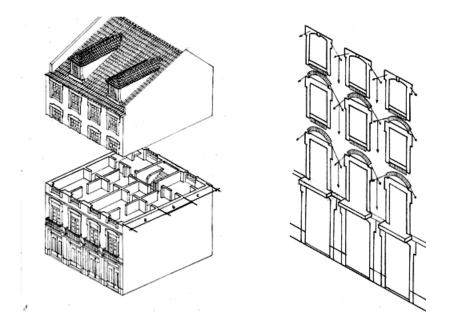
Perspective of a forementioned architectural dispositions and balance of forces on the façade.
